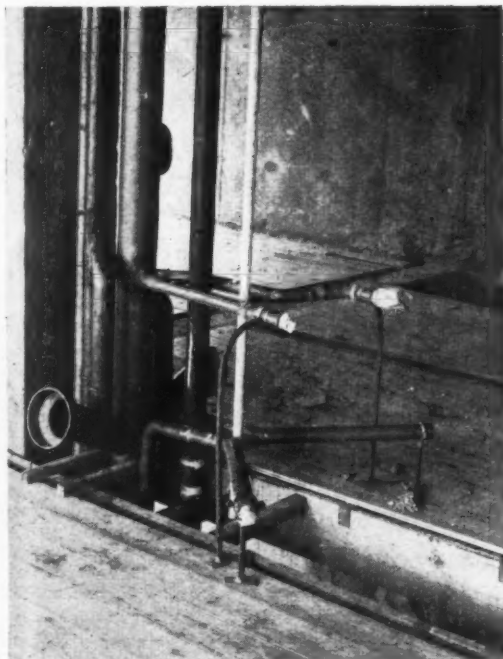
(above). Plumbing at bathroom level in 11-storey block, with connections for back-to-back w.c., bath and basin. From left to right: rising main, vent pipe, soil stack, gas main and cold water supply. The supporting brackets are temporary, holding the branches in position pending the fixing of equipment. Note "push fit" sockets.
